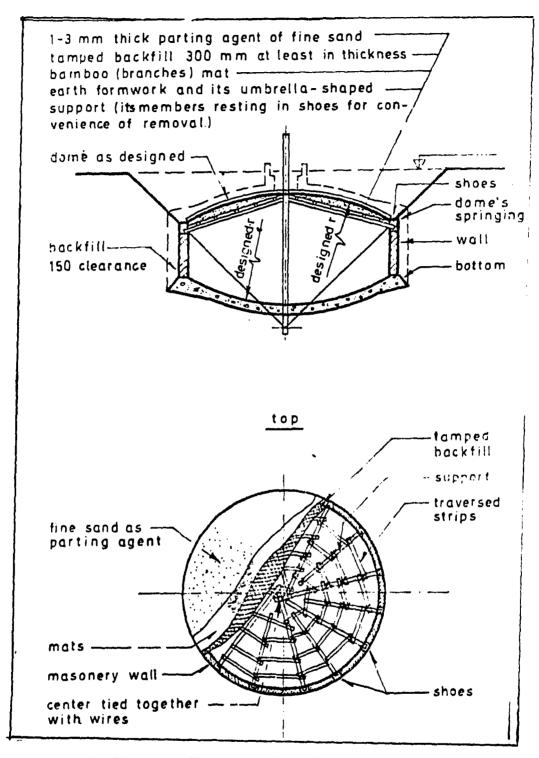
Overall Excavation with Cast Dome on a Bamboo Support
